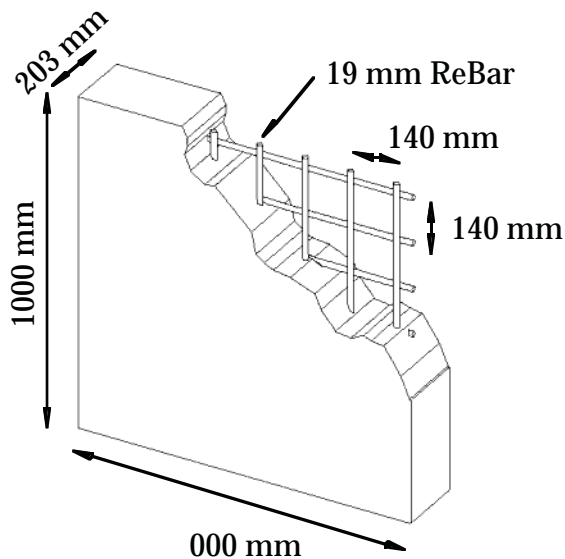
Reinforced concrete specimen RC881, nominally 203 mm thick, Batch #8 concrete mix with 1% steel.
